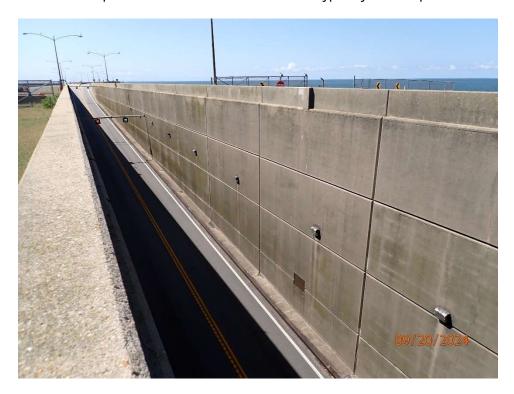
Portal Island 3 Open Approach Wall (west face); typical condition of approach wall.
